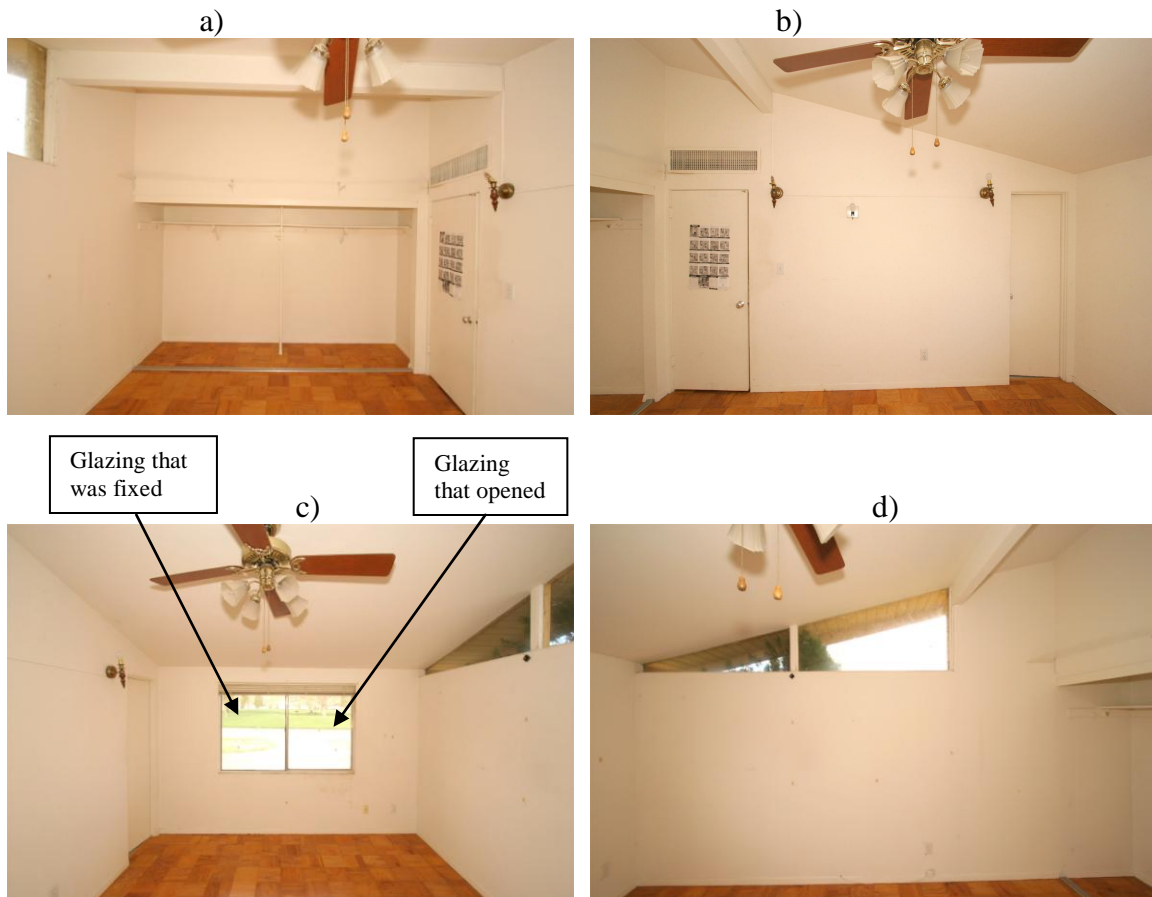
Photographs of the walls of the front bedroom; a) east wall, b) south wall, c) west wall, and d) north wall. See Appendix A for larger photographs and detailed drawings of this room.
